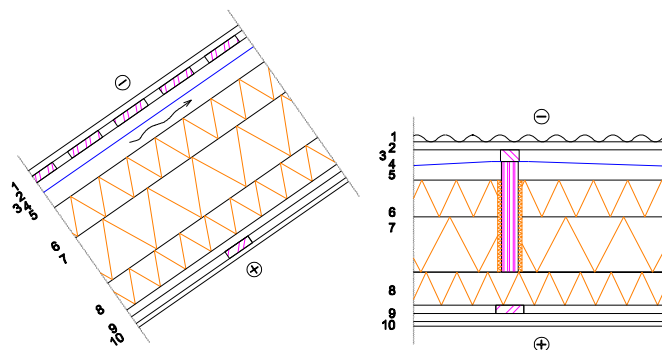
Section of ZEB's slab roof: 1 – roof cladding; 2 – solid deck; 3 – wood roll; 4 – anti-condensation membrane; 5 – ventilated gap $\geq 50 \text{ mm}$; 6 – ceiling supporting truss; 7 – slabs SPU AL 150+100 mm (the outer layer); 8 – slabs SPU AL 40 mm (internal continuous layer); 9 – space for laying of engineering communications; 10 – interior finishing layer .
